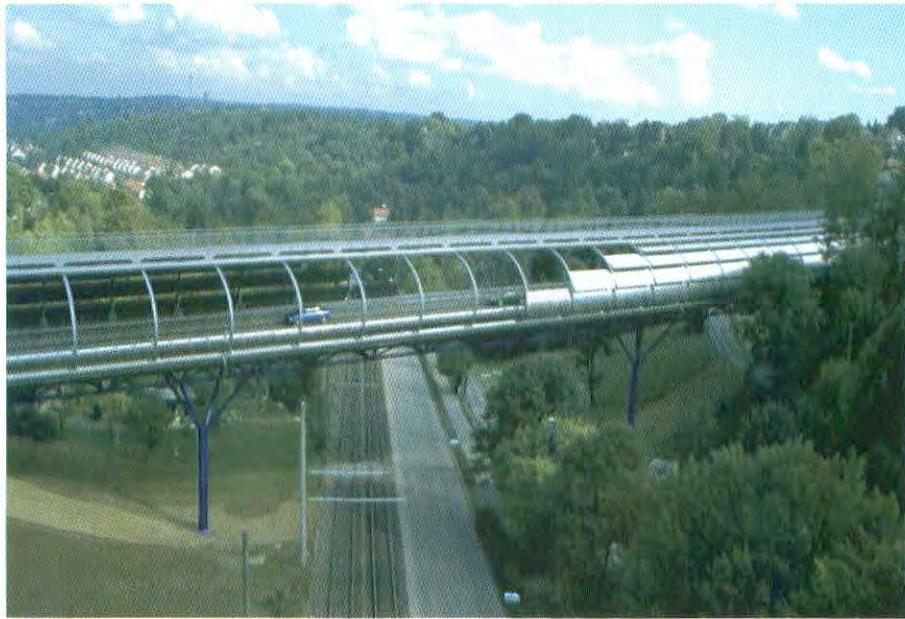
Bridge in a curve, direction of bridge lines and arrangement of elements
